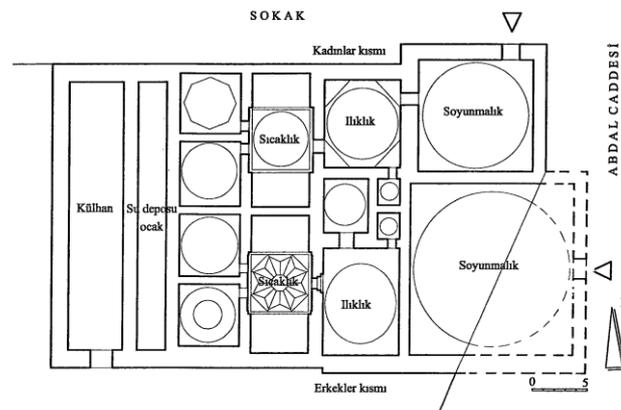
Ördekli bath plan (Bursa Chamber of Architects)
